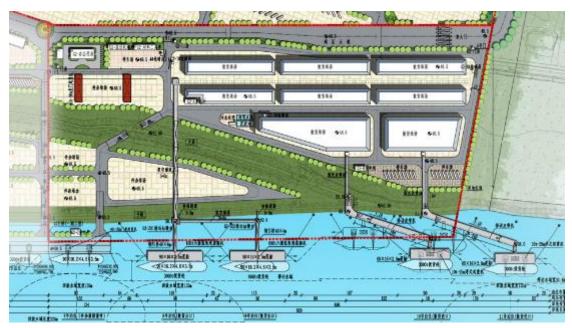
Layout plan of # 7 ~ # 11 Births (Scenario I)
